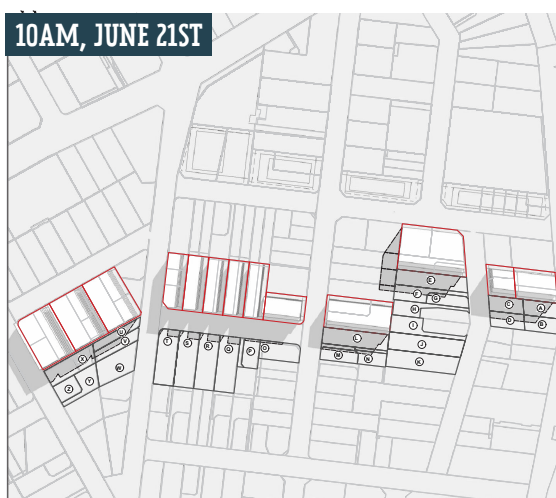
Building Shadows - 10am (For existing, not advertised controls)
